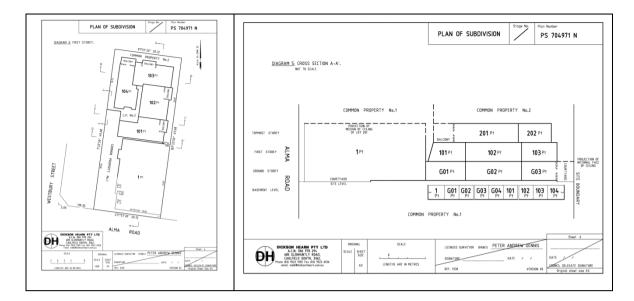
A building subdivision plan in Victoria including floor plans and cross-sections (Shojaei, et al., 2016)
